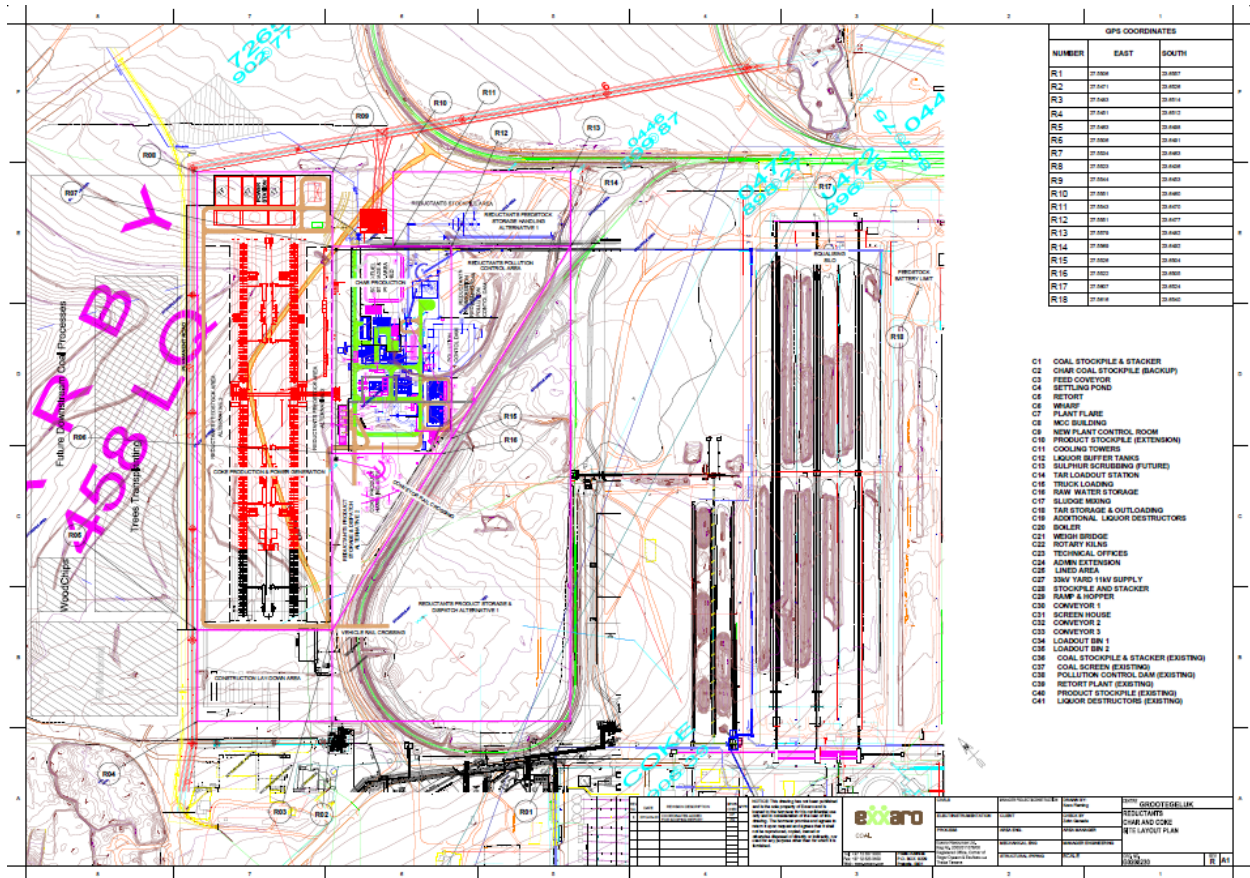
Preliminary site layout diagram (Exxaro Grootegeluk Coal Mine⁴).
